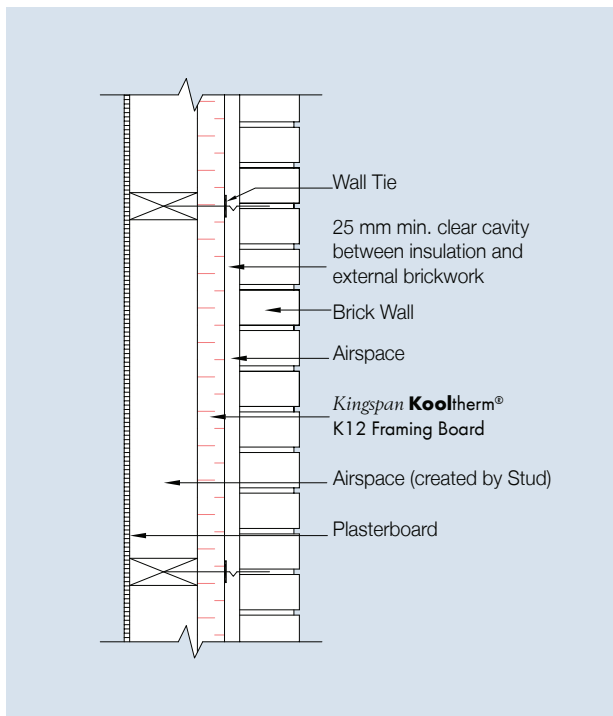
Side elevation – Brick Veneer wall with Kingspan Kooltherm® K12 Framing Board
